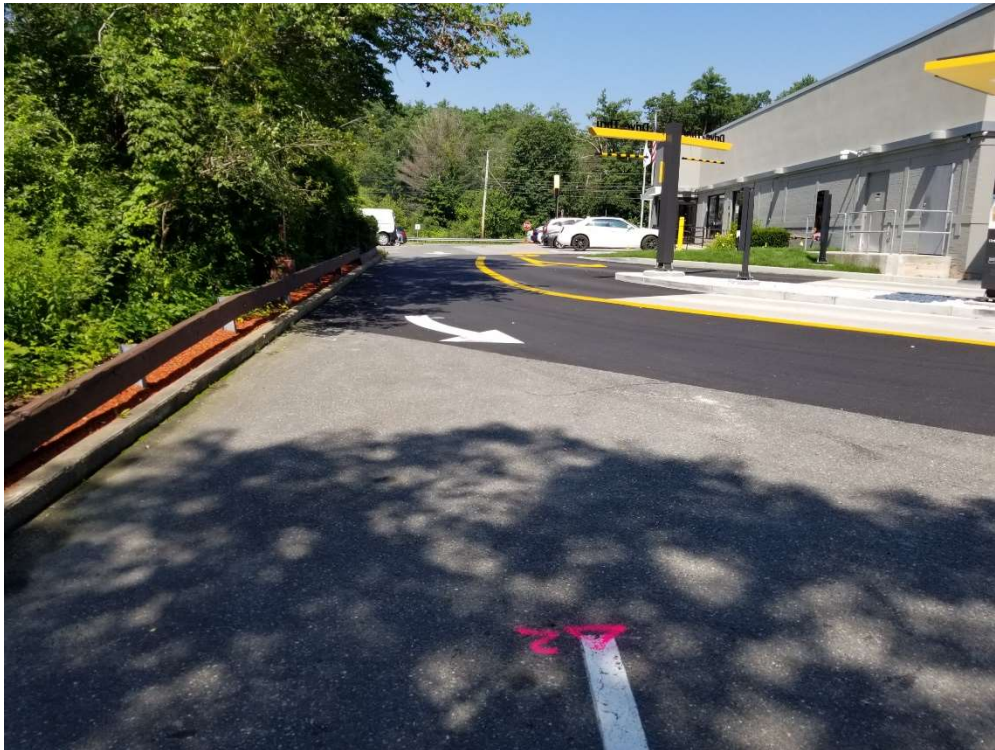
Photo of the drive-thru lane facing west toward Newburyport Turnpike (U.S. Route 1).
